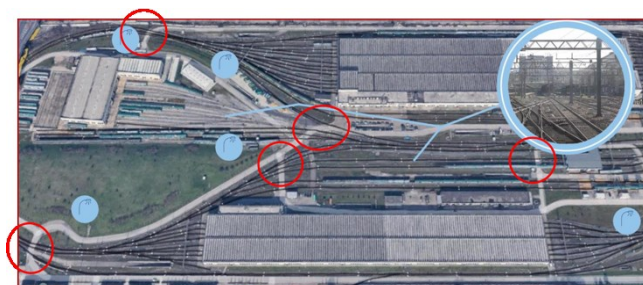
Maintenance area with insights of railway tracks intersections and beam towers.
